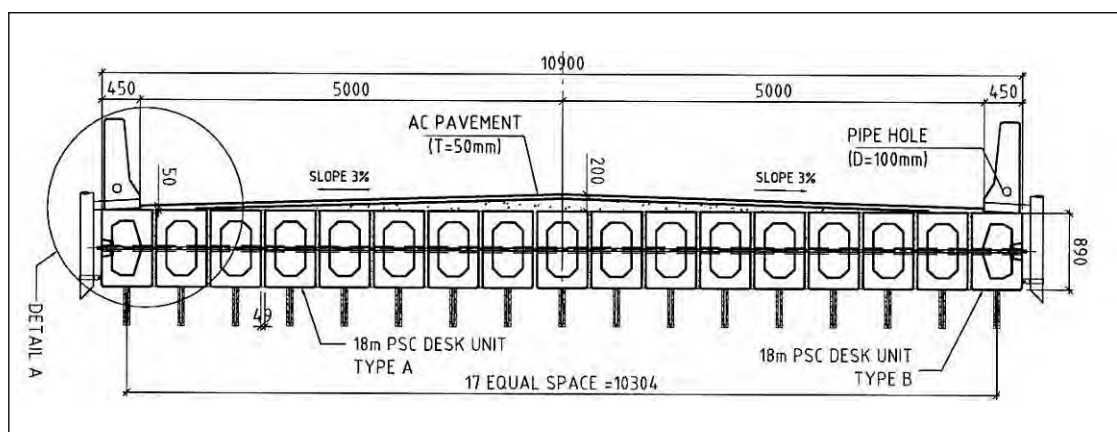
Typical Cross Section of PC Hollow Bridge
